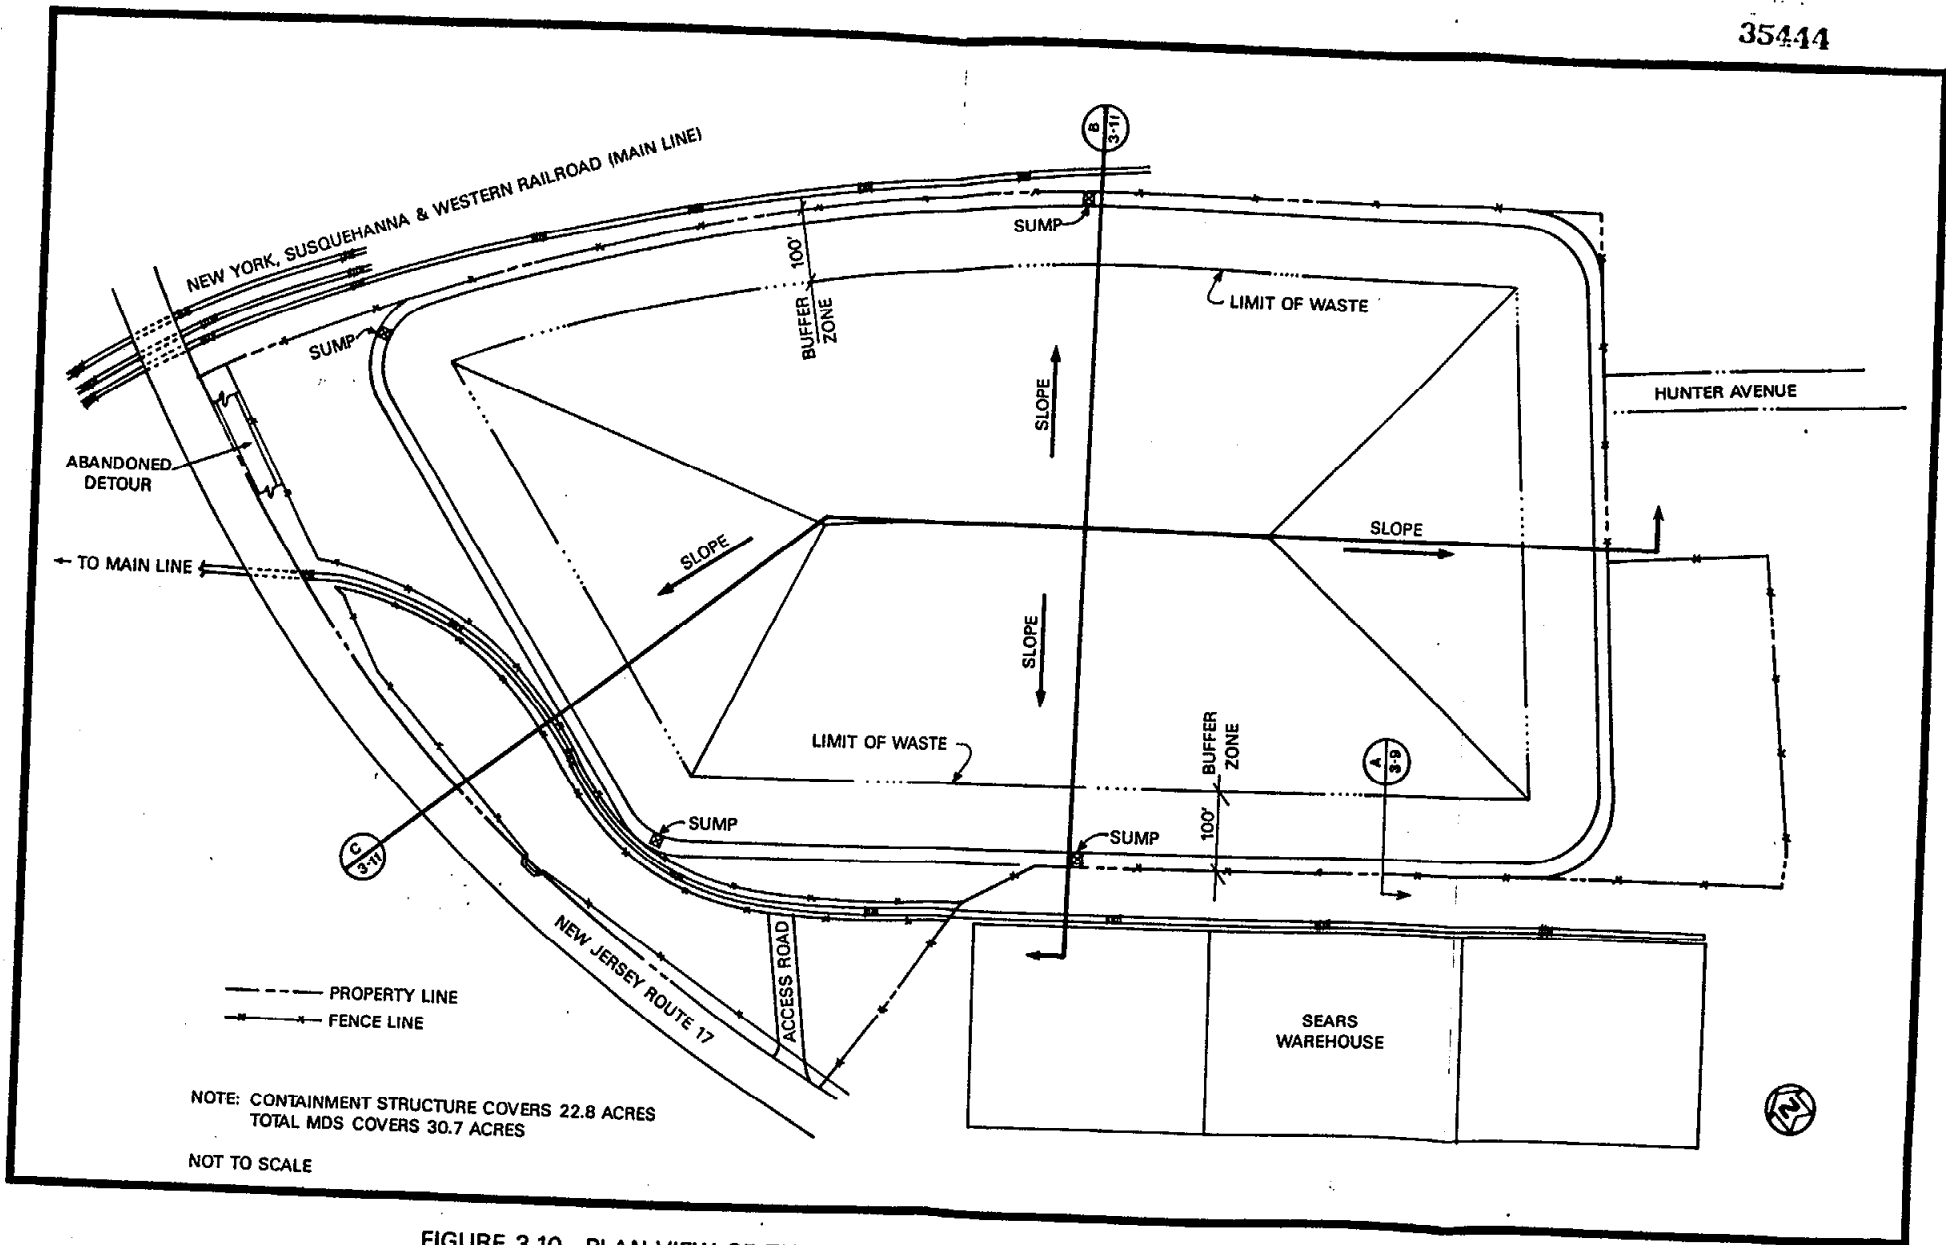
PLAN VIEW OF THE COMPLETED MAYWOOD DISPOSAL SITE (ALTERNATIVE 2)
